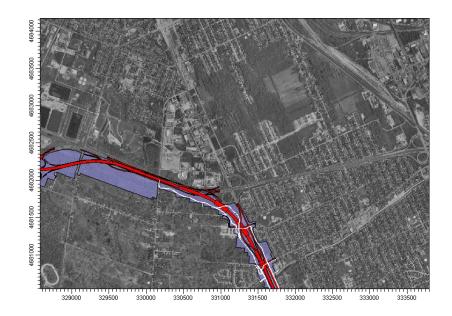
FIGURE SHOWING THE PARKWAY ALIGNMENT AND HURON CHURCH ROAD TO THE AMBASSADOR BRIDGE
